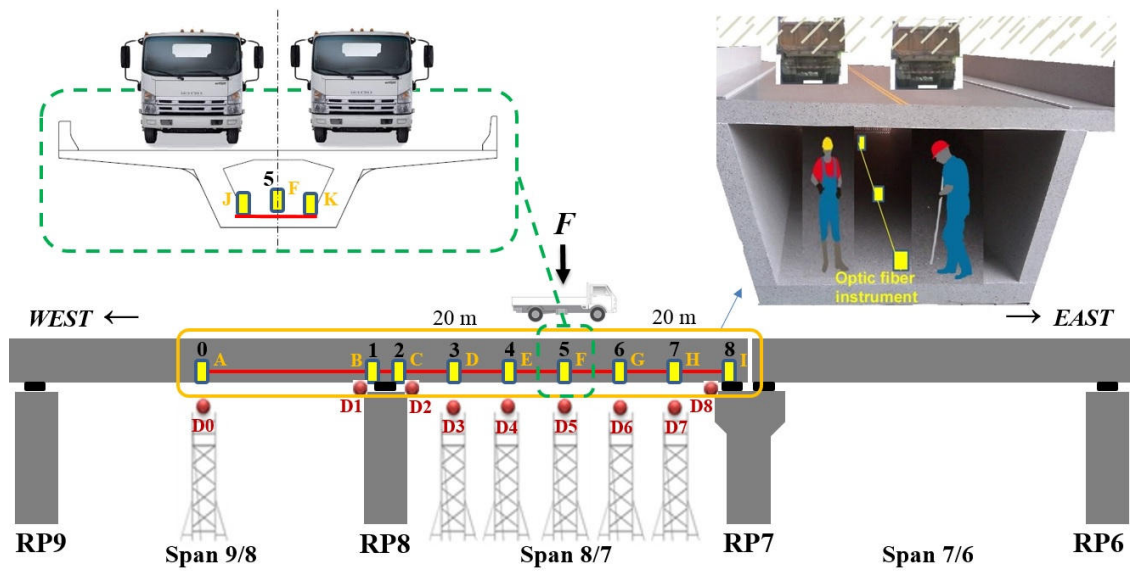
Test layout with locations of instrumented sections with dial indicator and FBG-DSM sensing systems.
